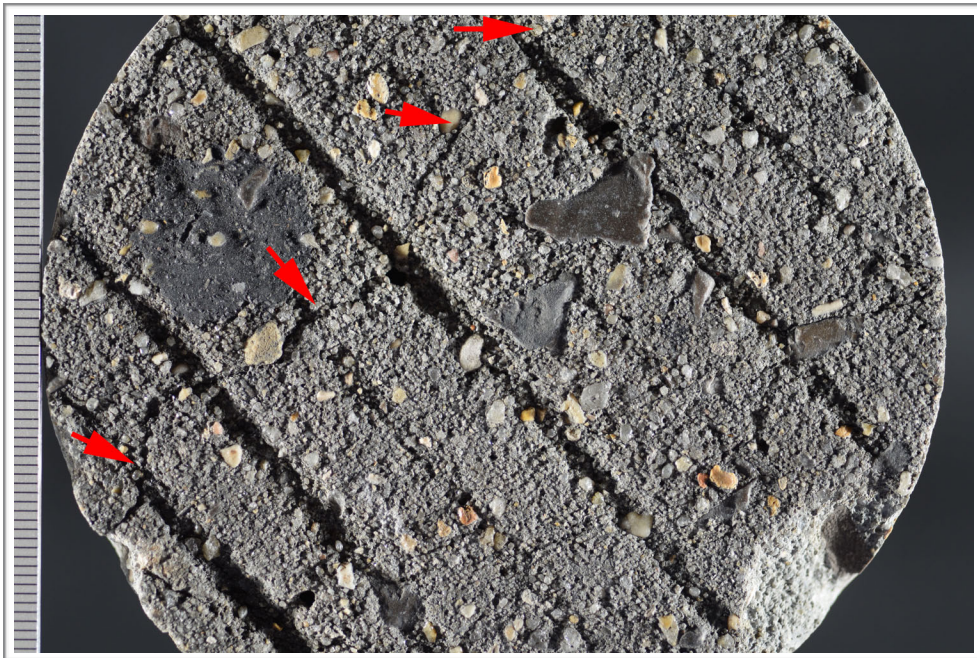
Photographs showing crack (red arrows) on the top surface; scale in millimeters.
